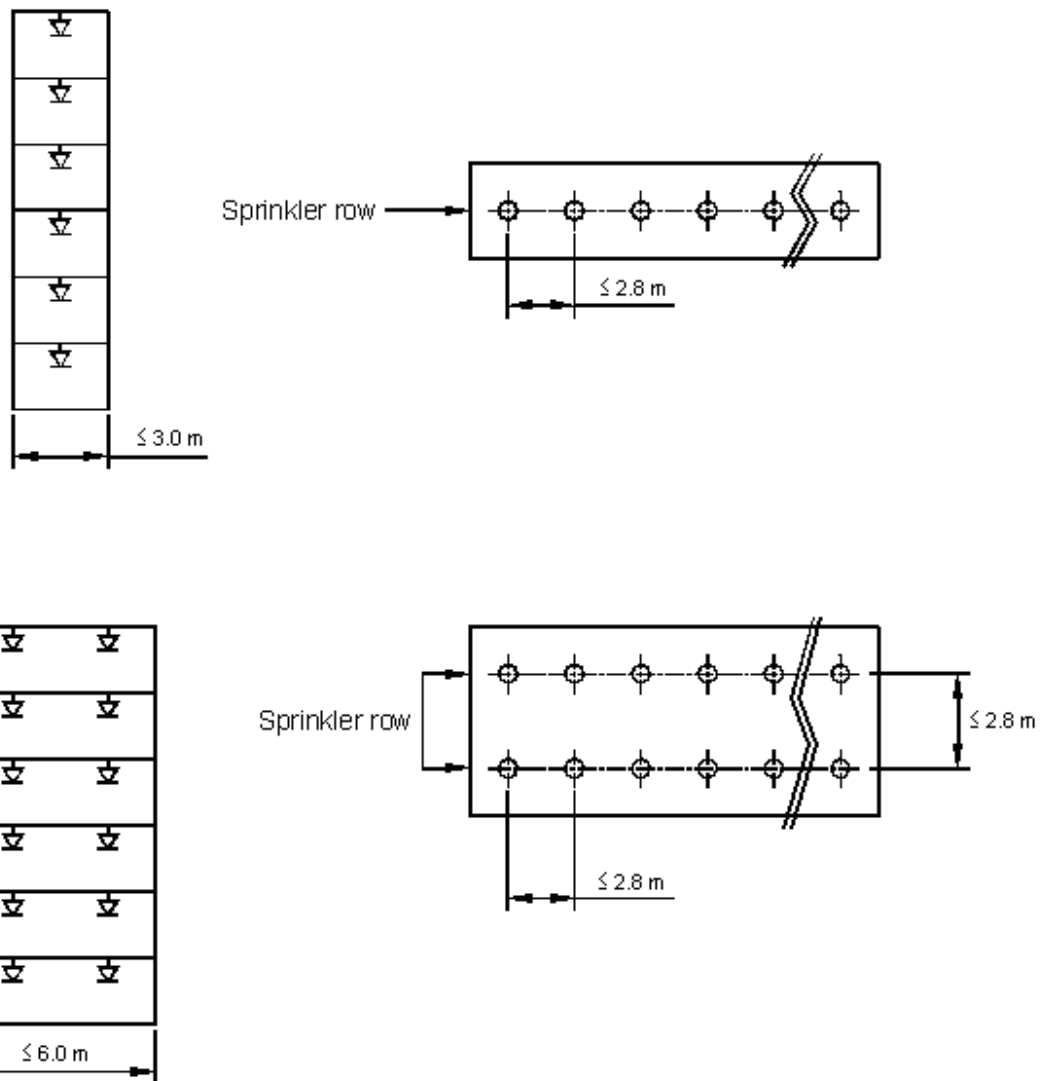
Location of intermediate sprinklers in type ST5 and ST6 storage
